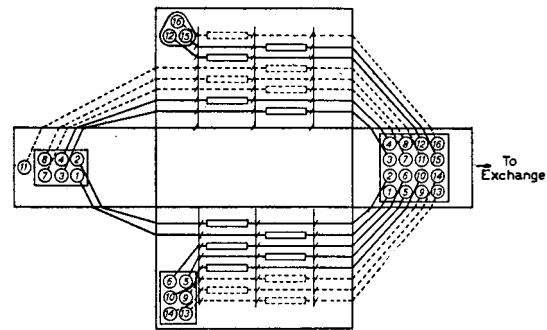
CABLE LAY-OUT IN JUNCTION MANHOLE.
